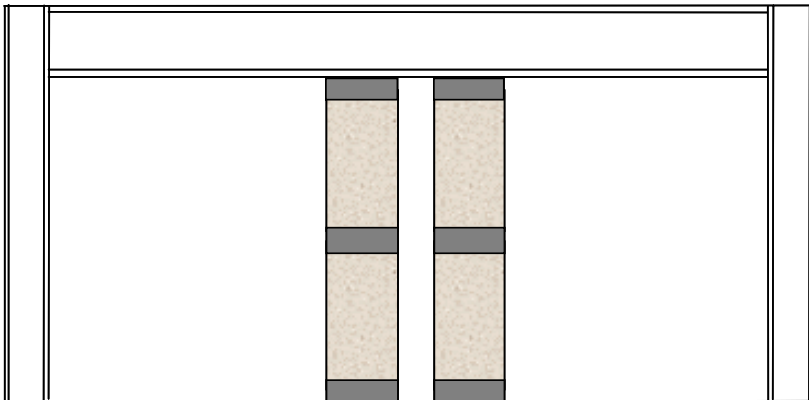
Schematic of frame with 2 beam-type infill sections added (*not to scale*)
